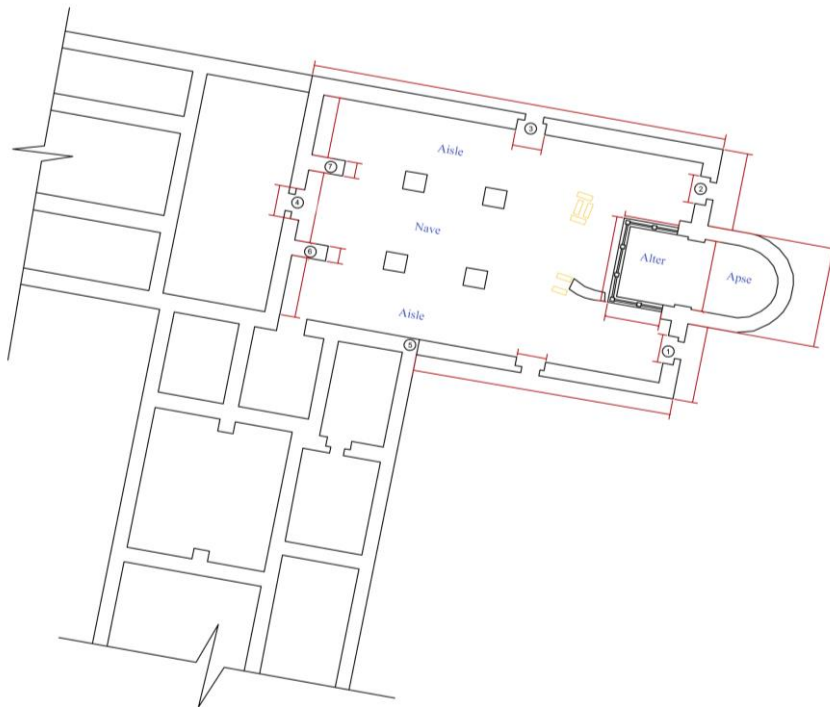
Two-dimensional drawings for Southwest plan with its surroundings. Scale 1:500
